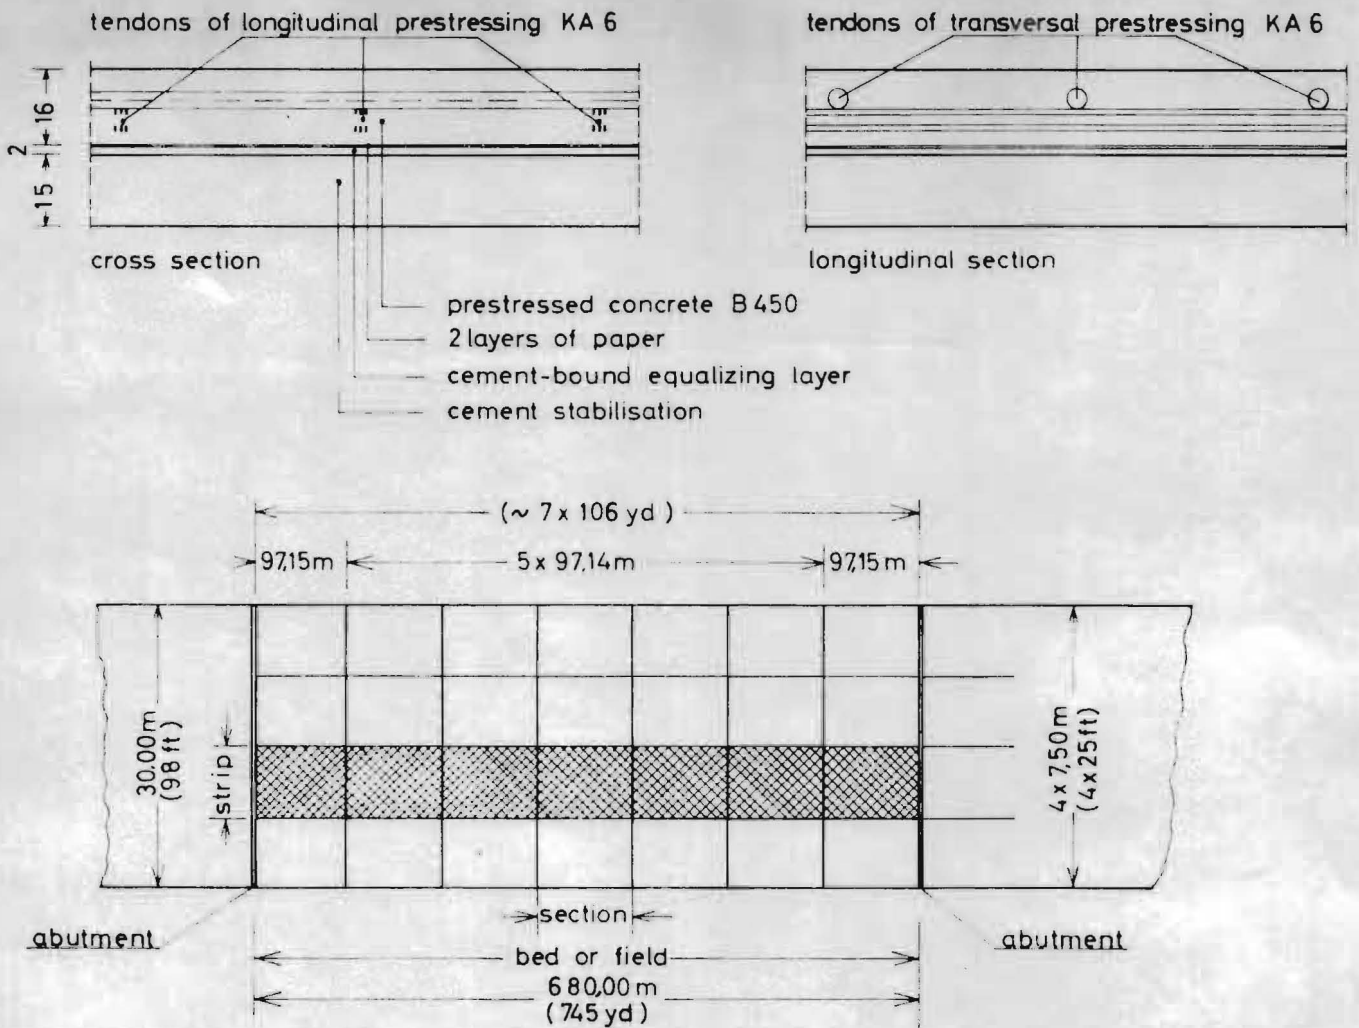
Longitudinal and transverse sections of prestressed concrete slab and notation used for prestressed concrete system
